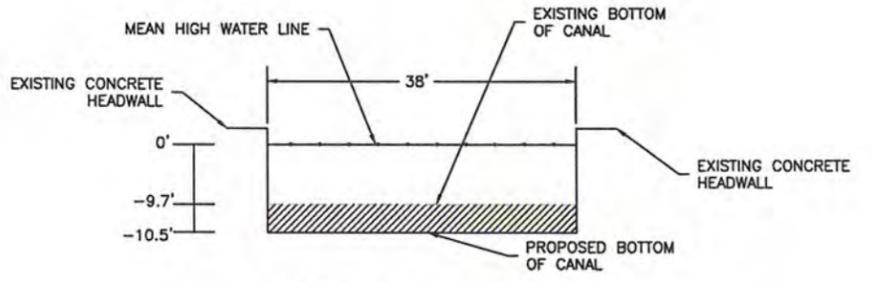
DETAIL SITE LAYOUT - ORGANIC REMOVAL
